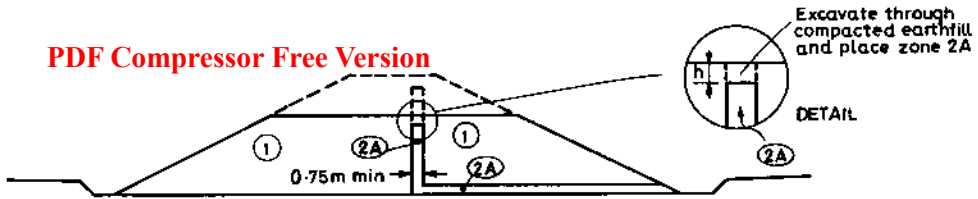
Construction of vertical chimney drain by excavation through earthfill.
